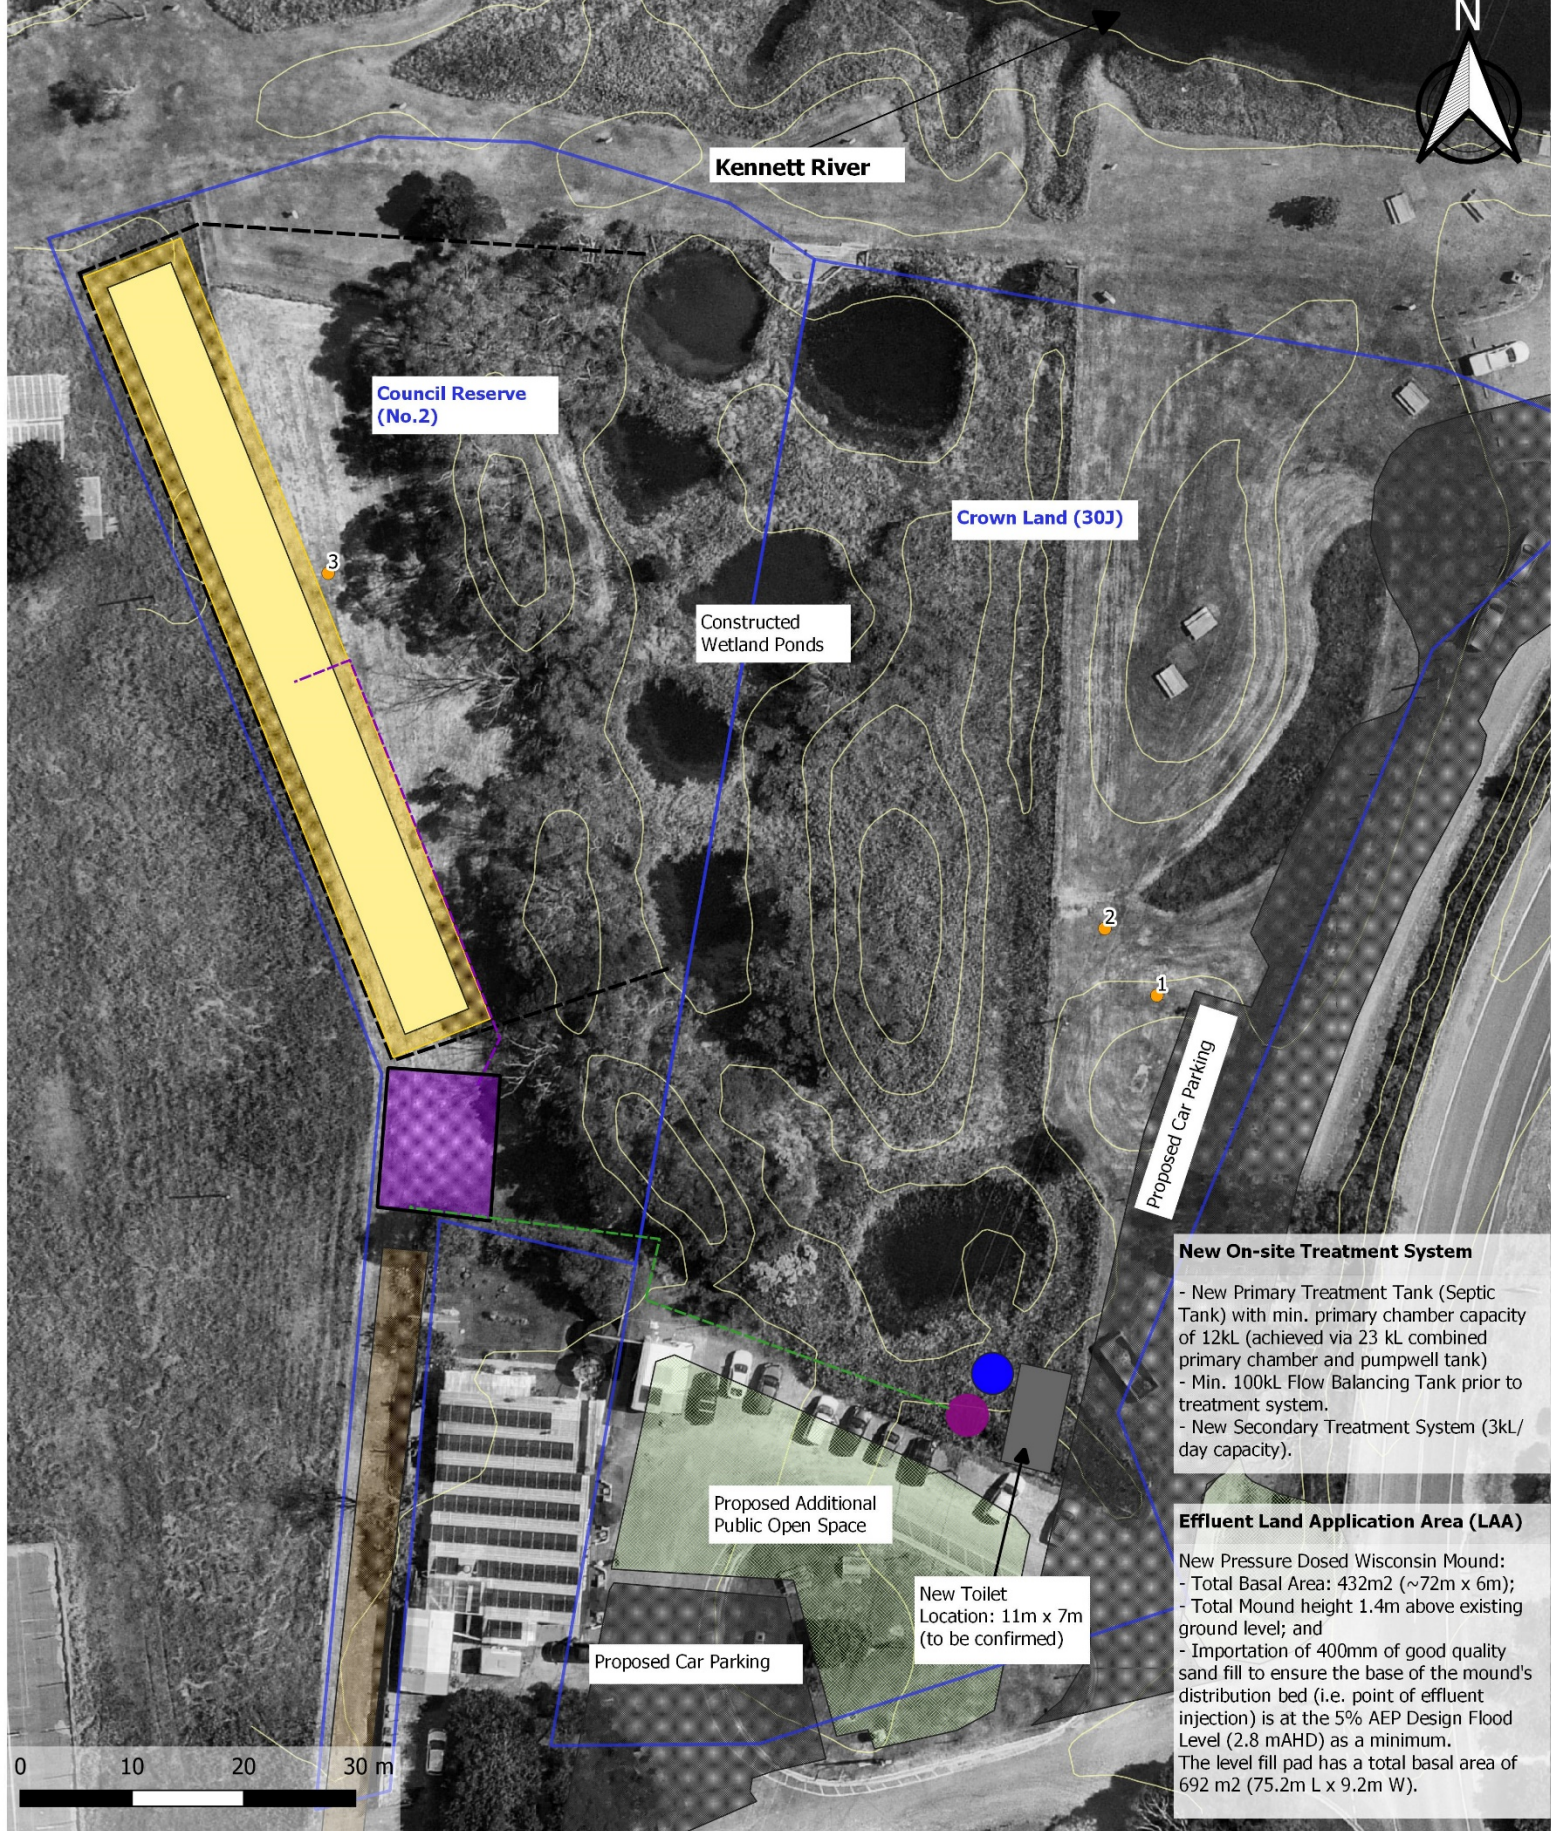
On-site Wastewater Management Plan - Kennett River Public Toilets
